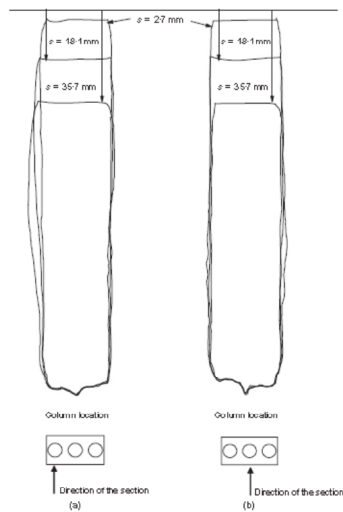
Outlines of sand columns during foundation loading process, strip footing, column length 150 mm, TS-03: (a) edge column; (b) centre column (McKelvey, 2004)
